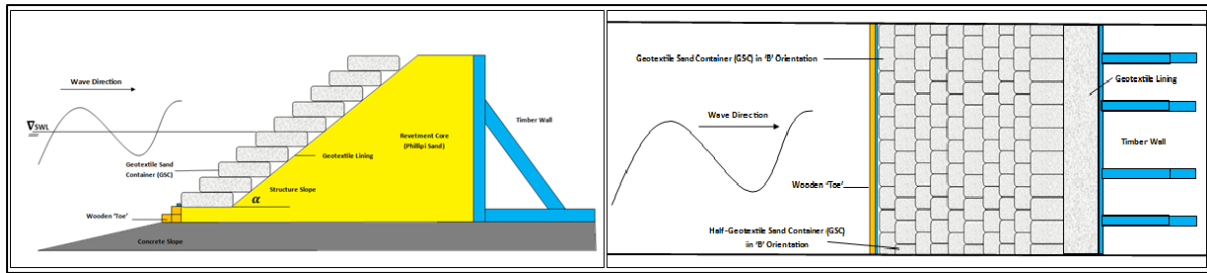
Schematic Cross-section (Left) and Plan View (Right) of GSC Revetment for Test Series 2
